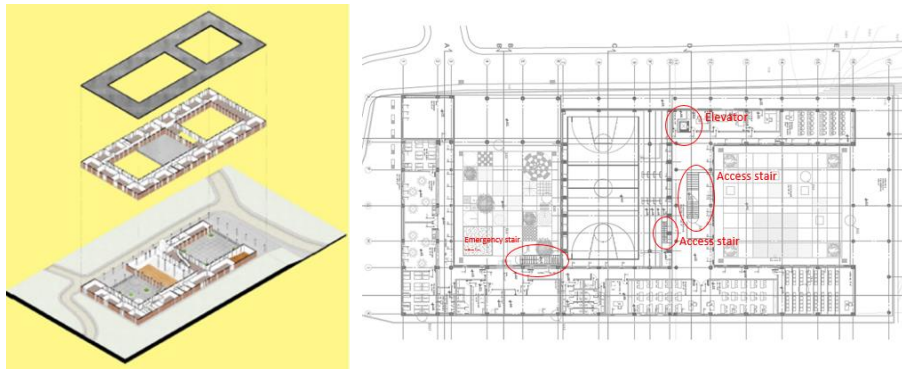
Volumetry of the building (left); layout of the first floor (right).
